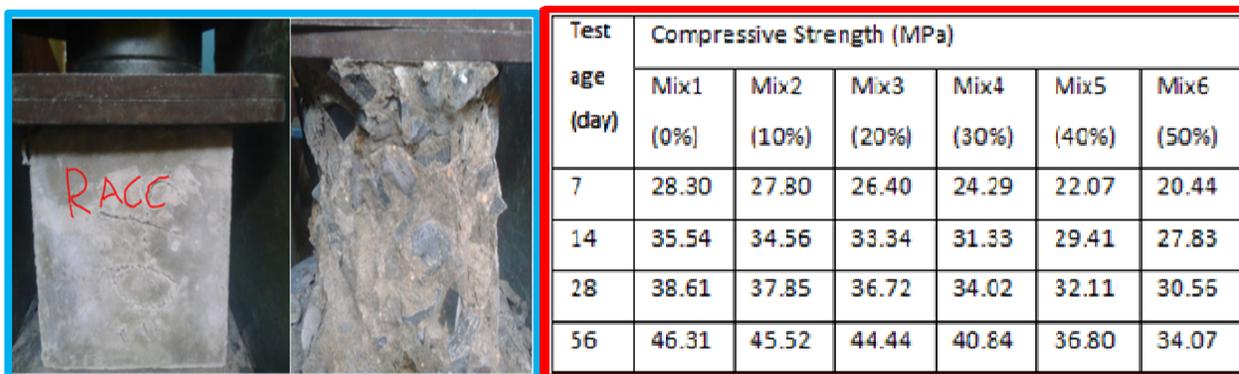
Compressive strength of concrete ready for testing and failure surface after testing
